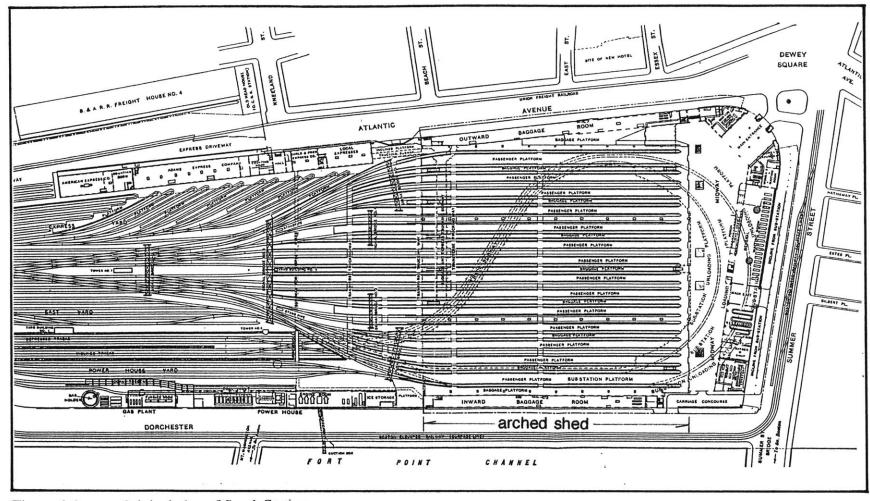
Original plan of South Station Source: Richard C. Barrett, Boston's Depots and Terminals, 1996, p. 156.
